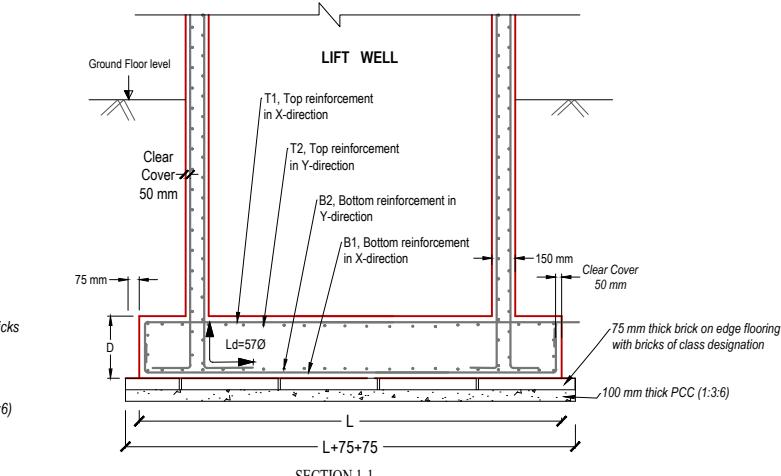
TYPICAL SECTION SECTION PLAN &amp; ELEVATION OF LIFT SHEAR WALL
